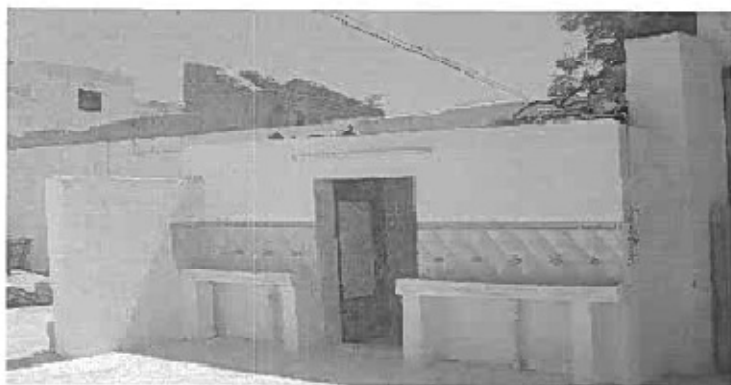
Rest rooms at the main entrance – need to be rebuilt to be used as access control room, there is no other ulternative.
